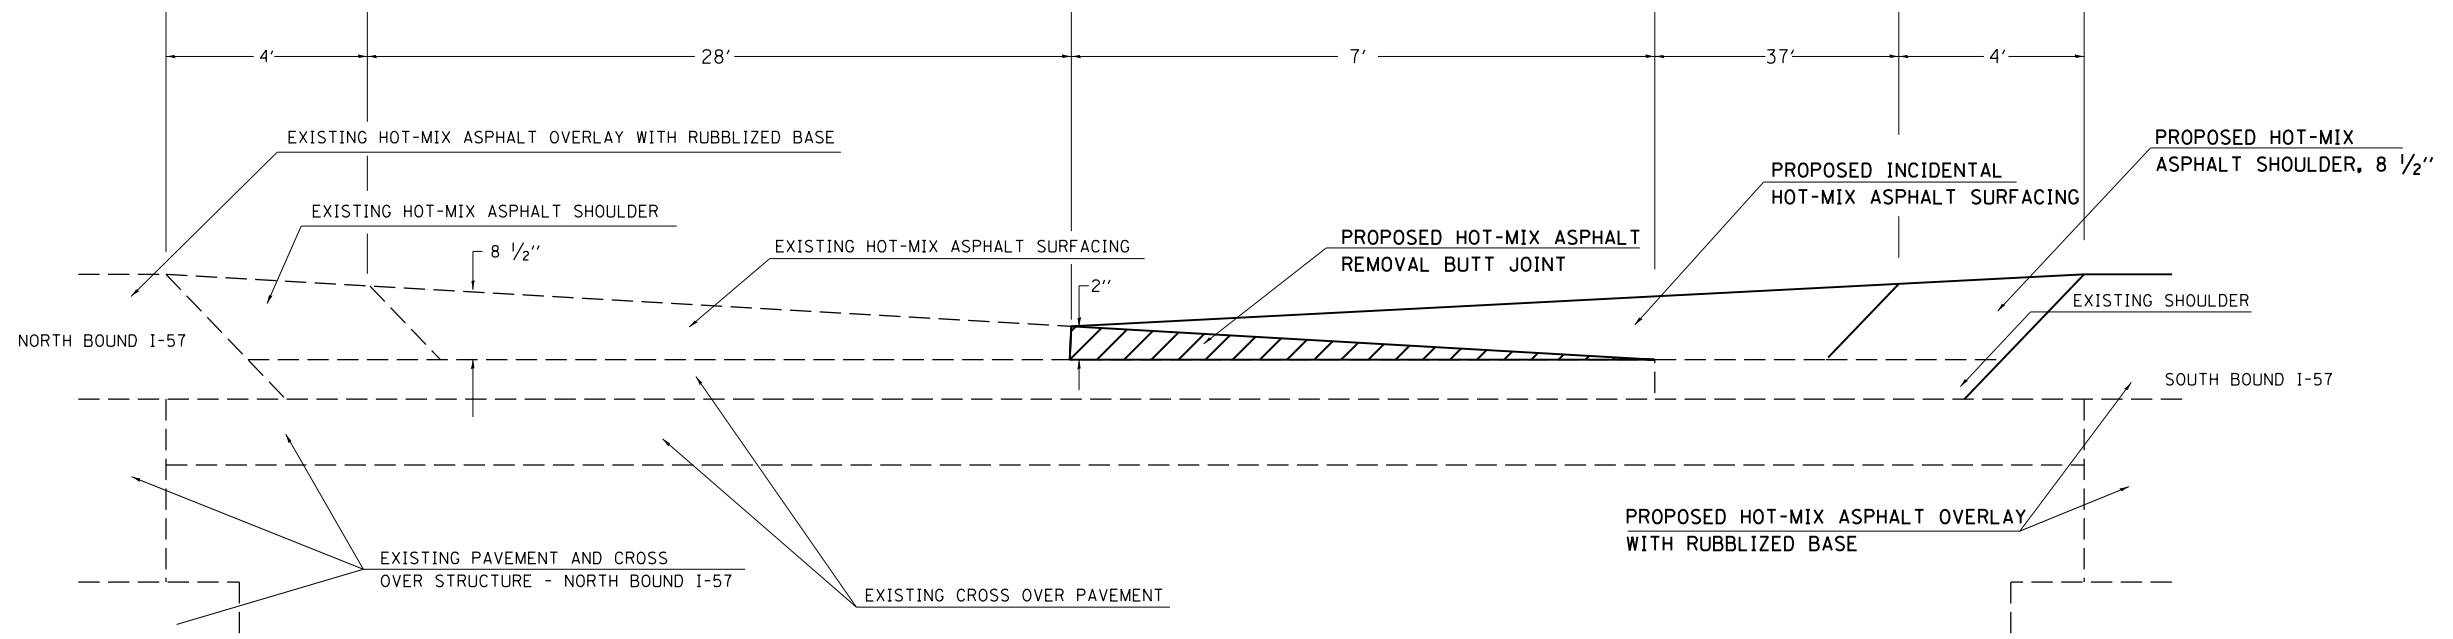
## DETAIL OF MEDIAN CROSSOVER PLAN VIEW
